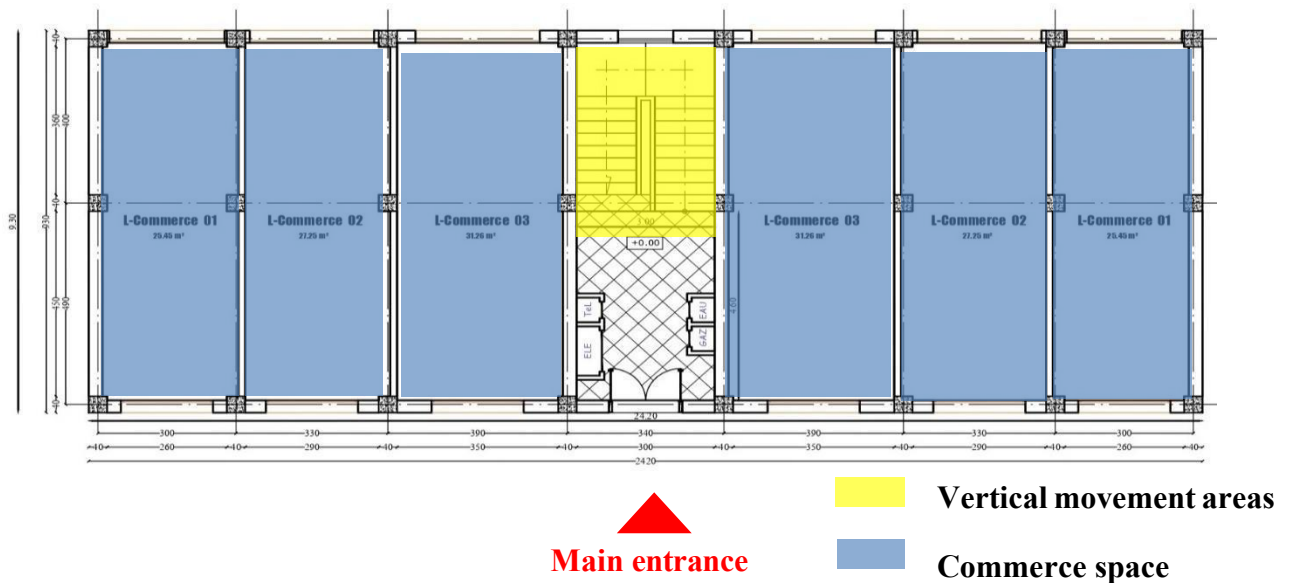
Ground floor of bar block (Source: design office Nebar Omar +Author treatment , 2025).
